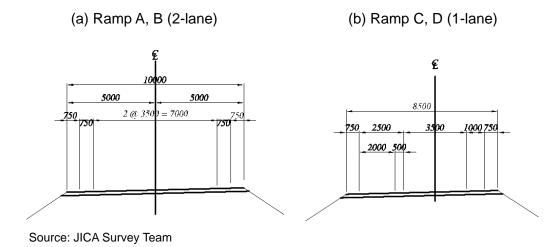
Typical Cross Section of Ramps in CKE Interchange
